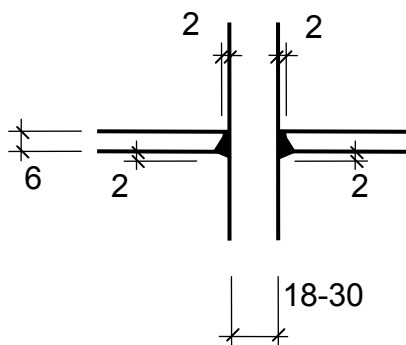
Welded joint of troughs to webs of cross-beams
